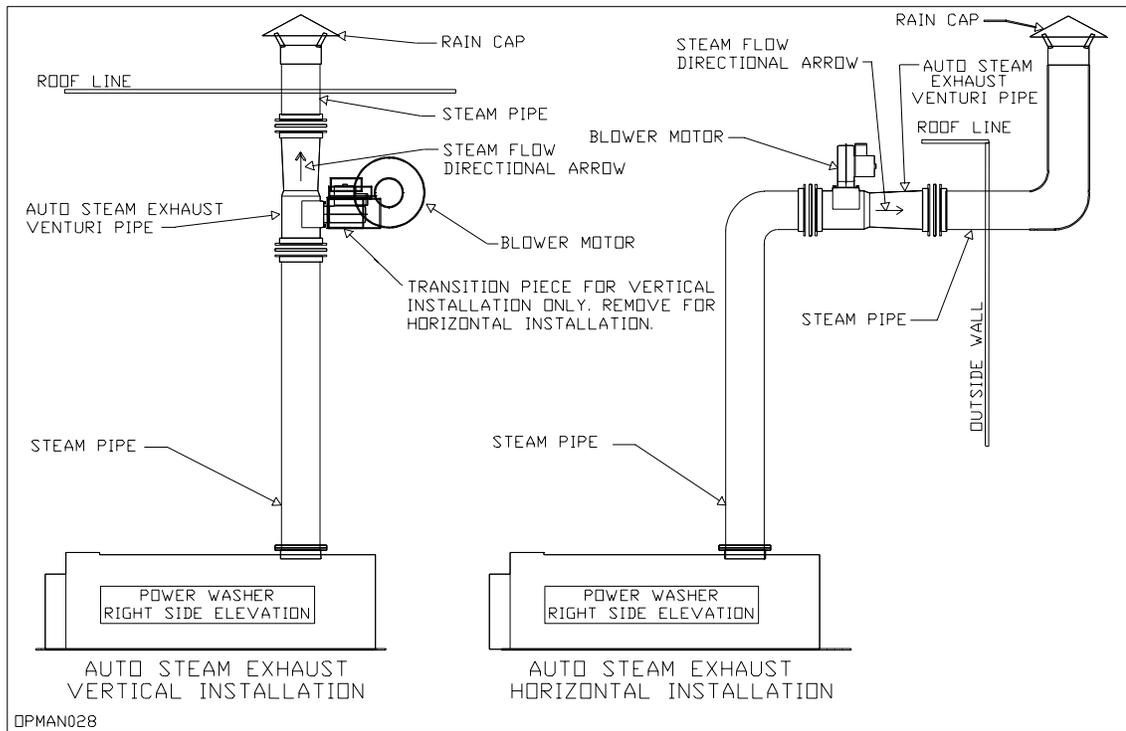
11: Auto Steam Exhaust (ASE) Piping and Blower Installation Configurations
